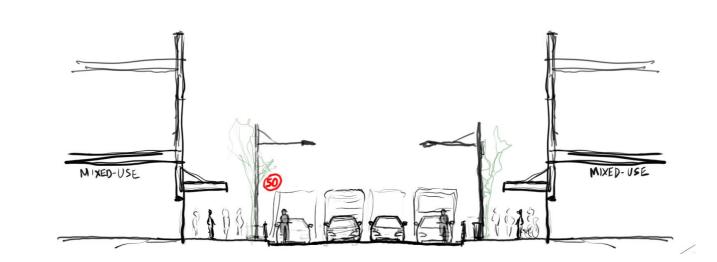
Street section sketch showing the 'Barrier fence' scenario.
